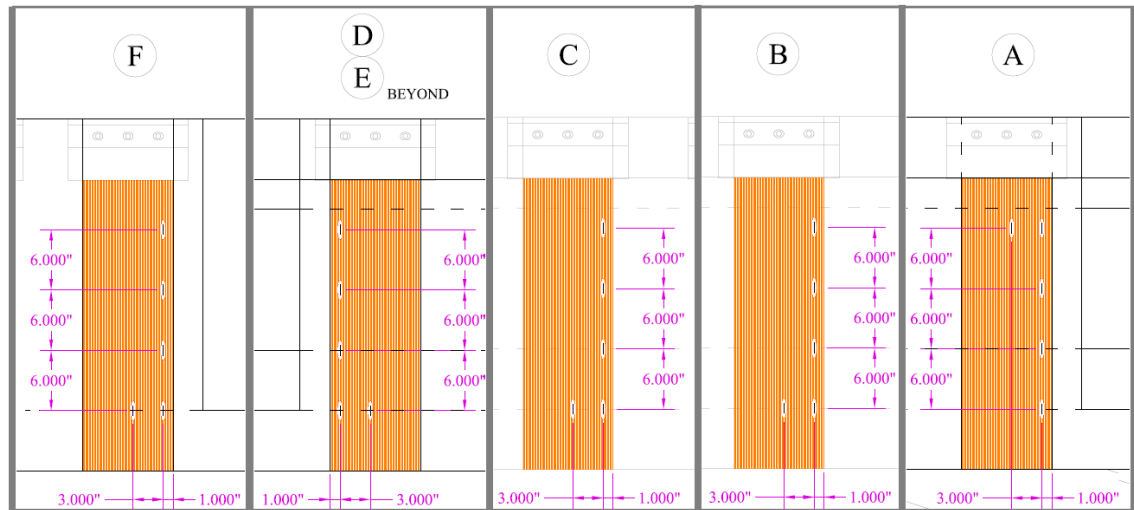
The FBG sensor layouts for each of the stirrups instrumented.
